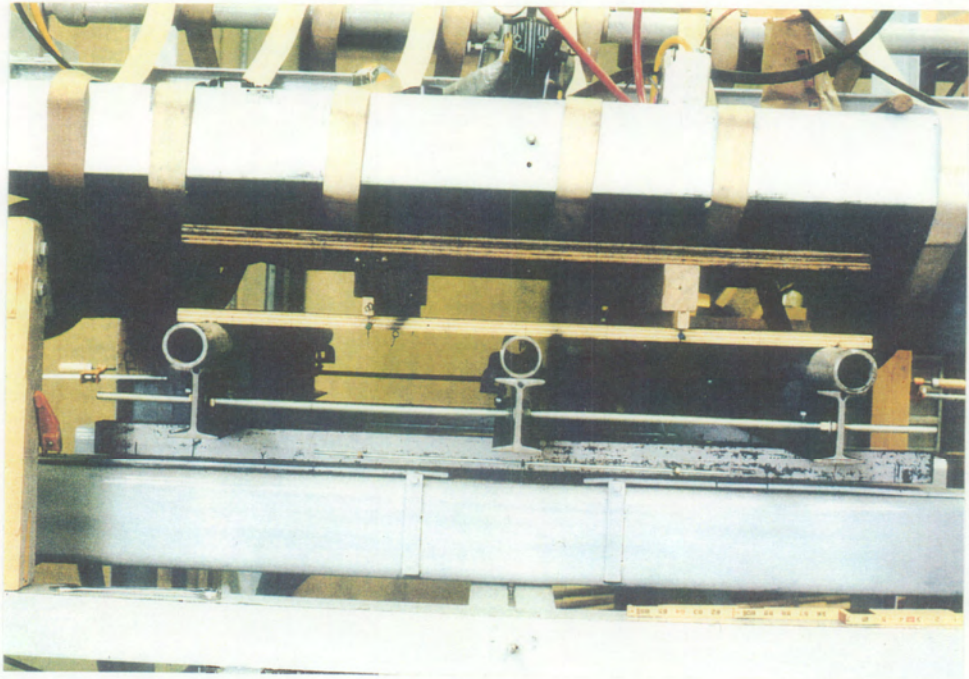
Setup for Testing Panels in Bending on the Air-Bag Testing Machine at VPI & SU.
